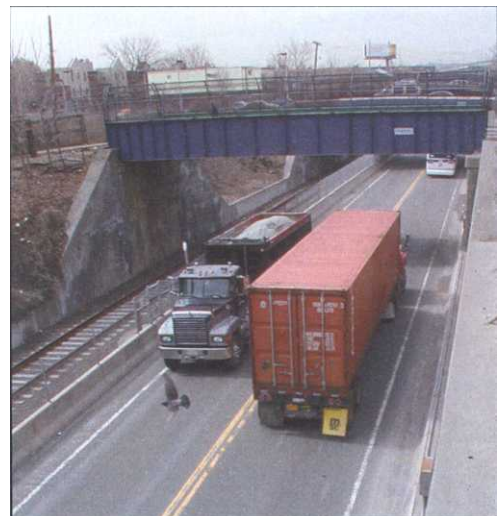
South Boston Haul Road, Boston, Massachusetts.
